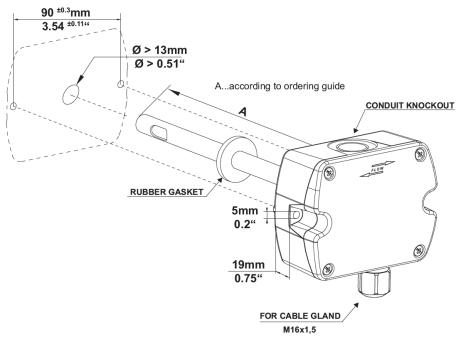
Direct mounting on duct (probe length A = 200 mm)
